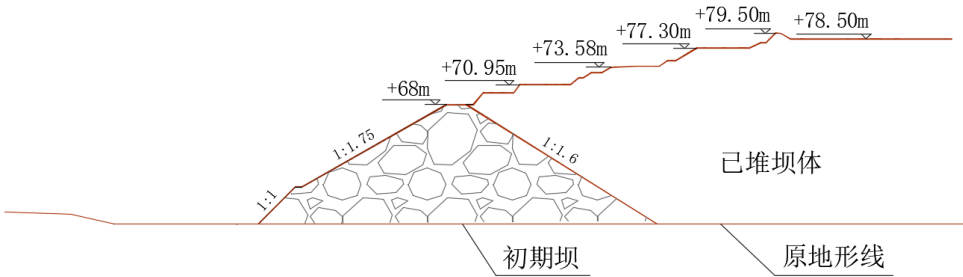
Typical cross-sectional diagram of the current status of tailings dam
